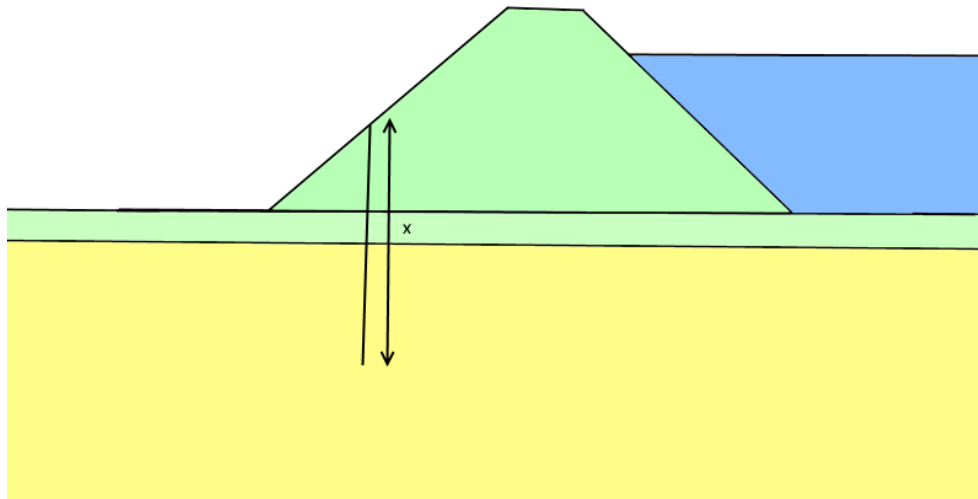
calculation of sheet pile wall per x meter for 1 meter of dike
